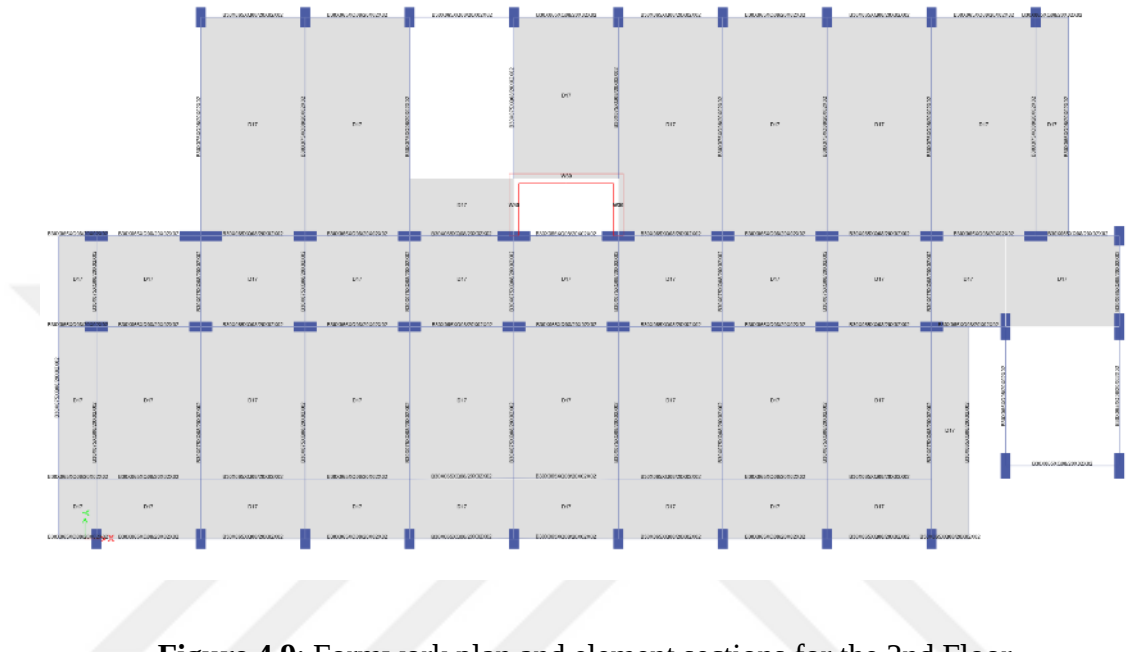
Formwork plan and element sections for the 2nd Floor.
